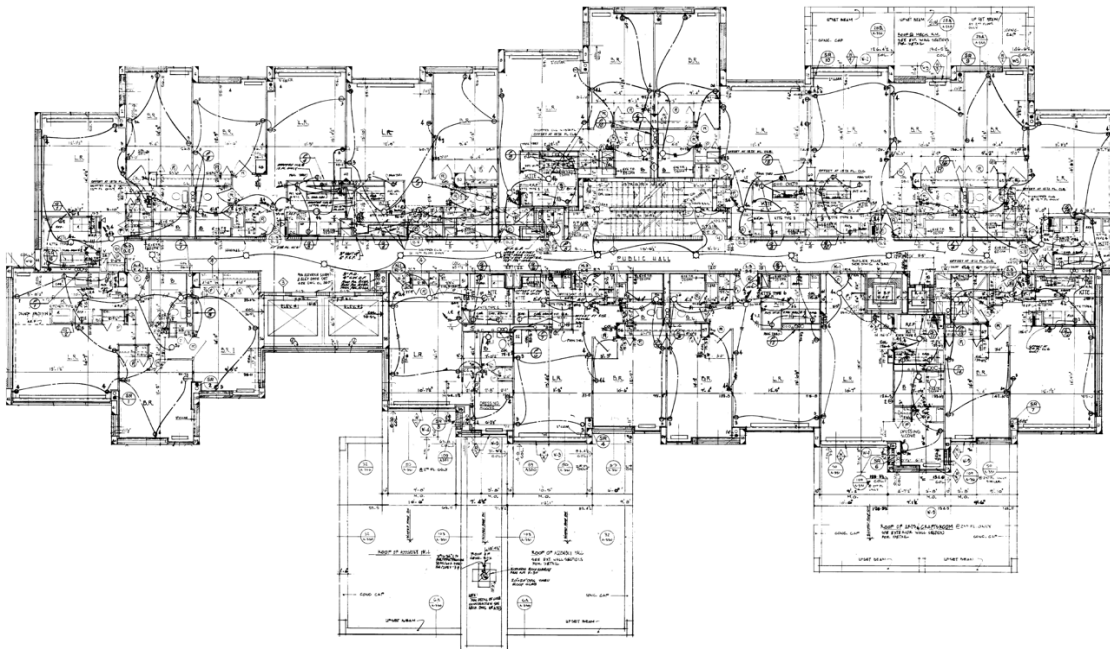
Typical upper floor plan, 1969. (NYCHA)
